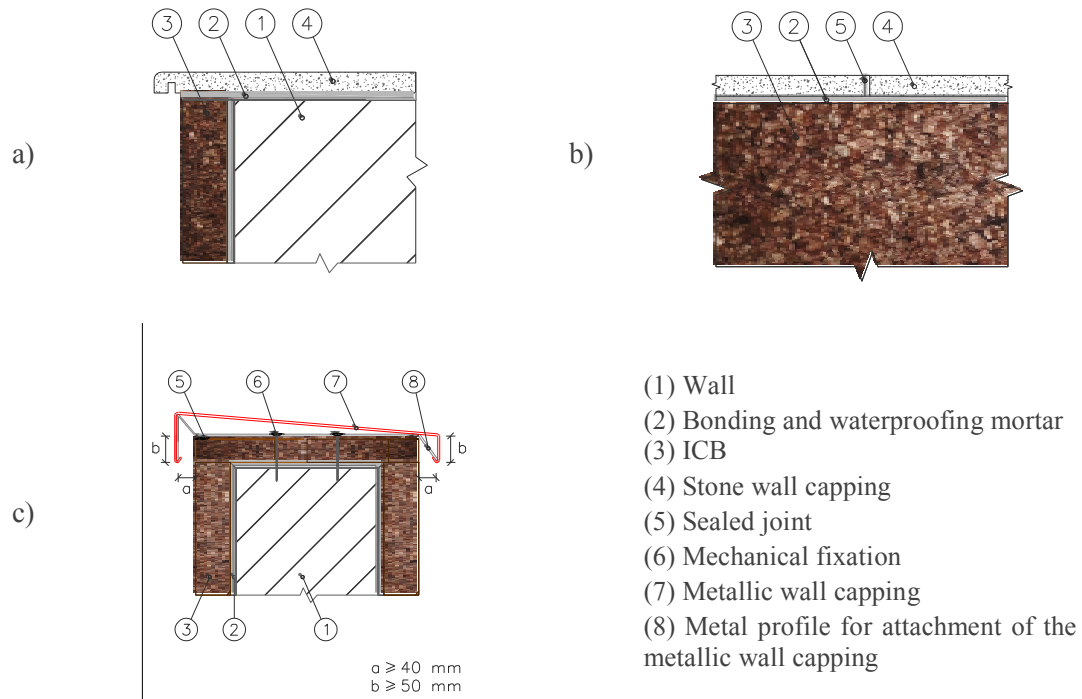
Wall capping: a) Top cover cross section; b) Top cover front view; c) Metallic wall capping.
